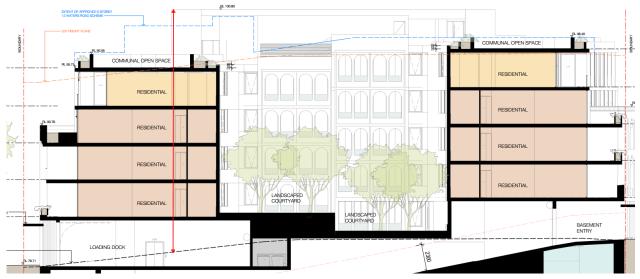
Extract from architectural section drawing DA-0601 - Vertical red line showing the maximum building height of the proposed development
